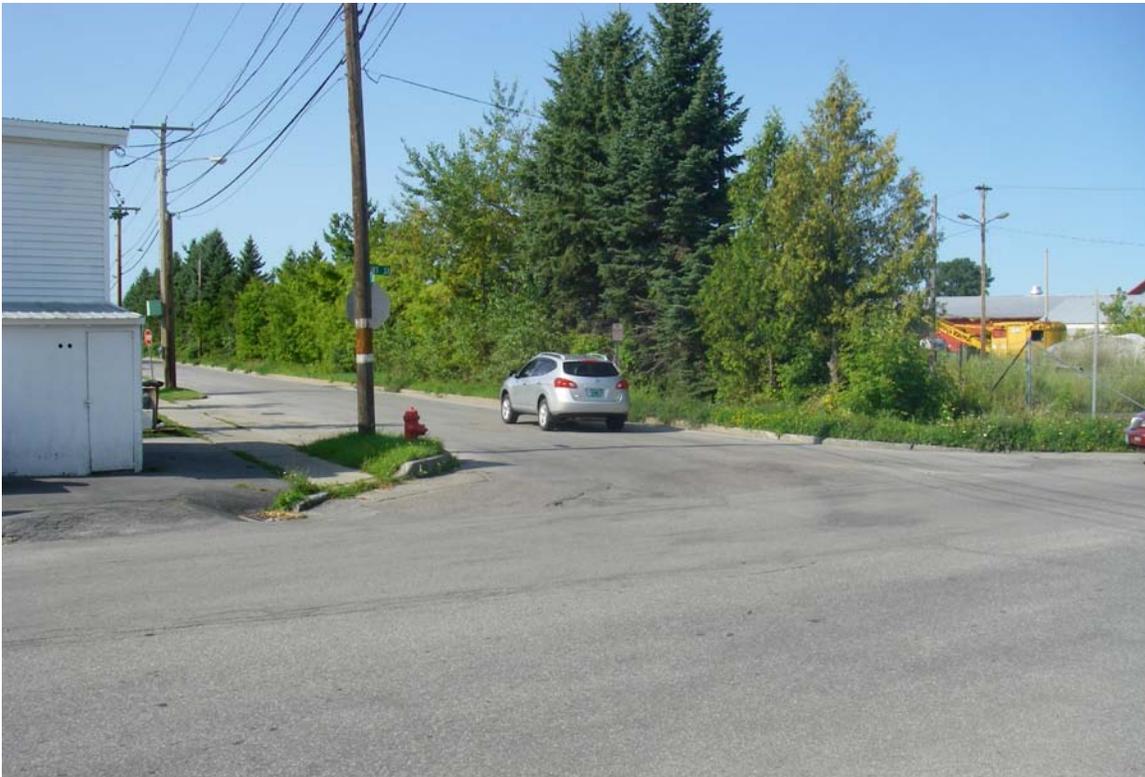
Segment 3, view southwest from Stebbins Street to its intersection with Allen Street (VHB Photo: 2010-08-18-TTC_057).
